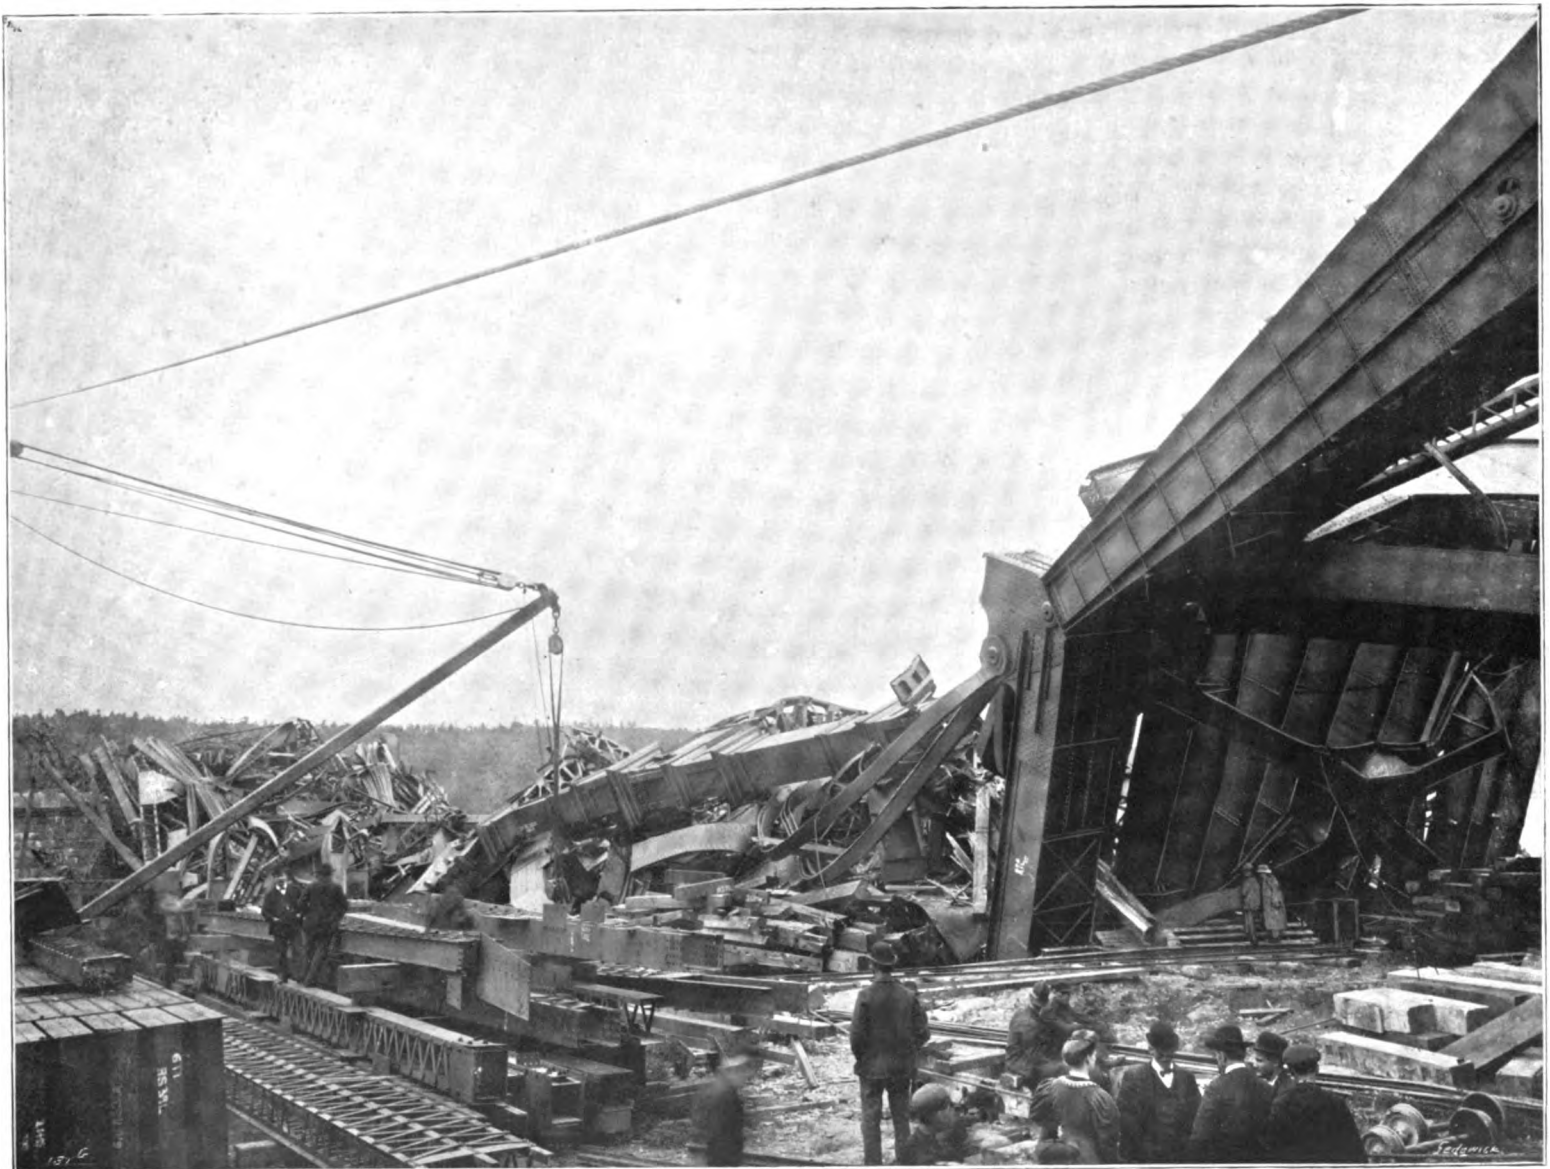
THE WRECK NEAR THE ANCHOR PIER.
